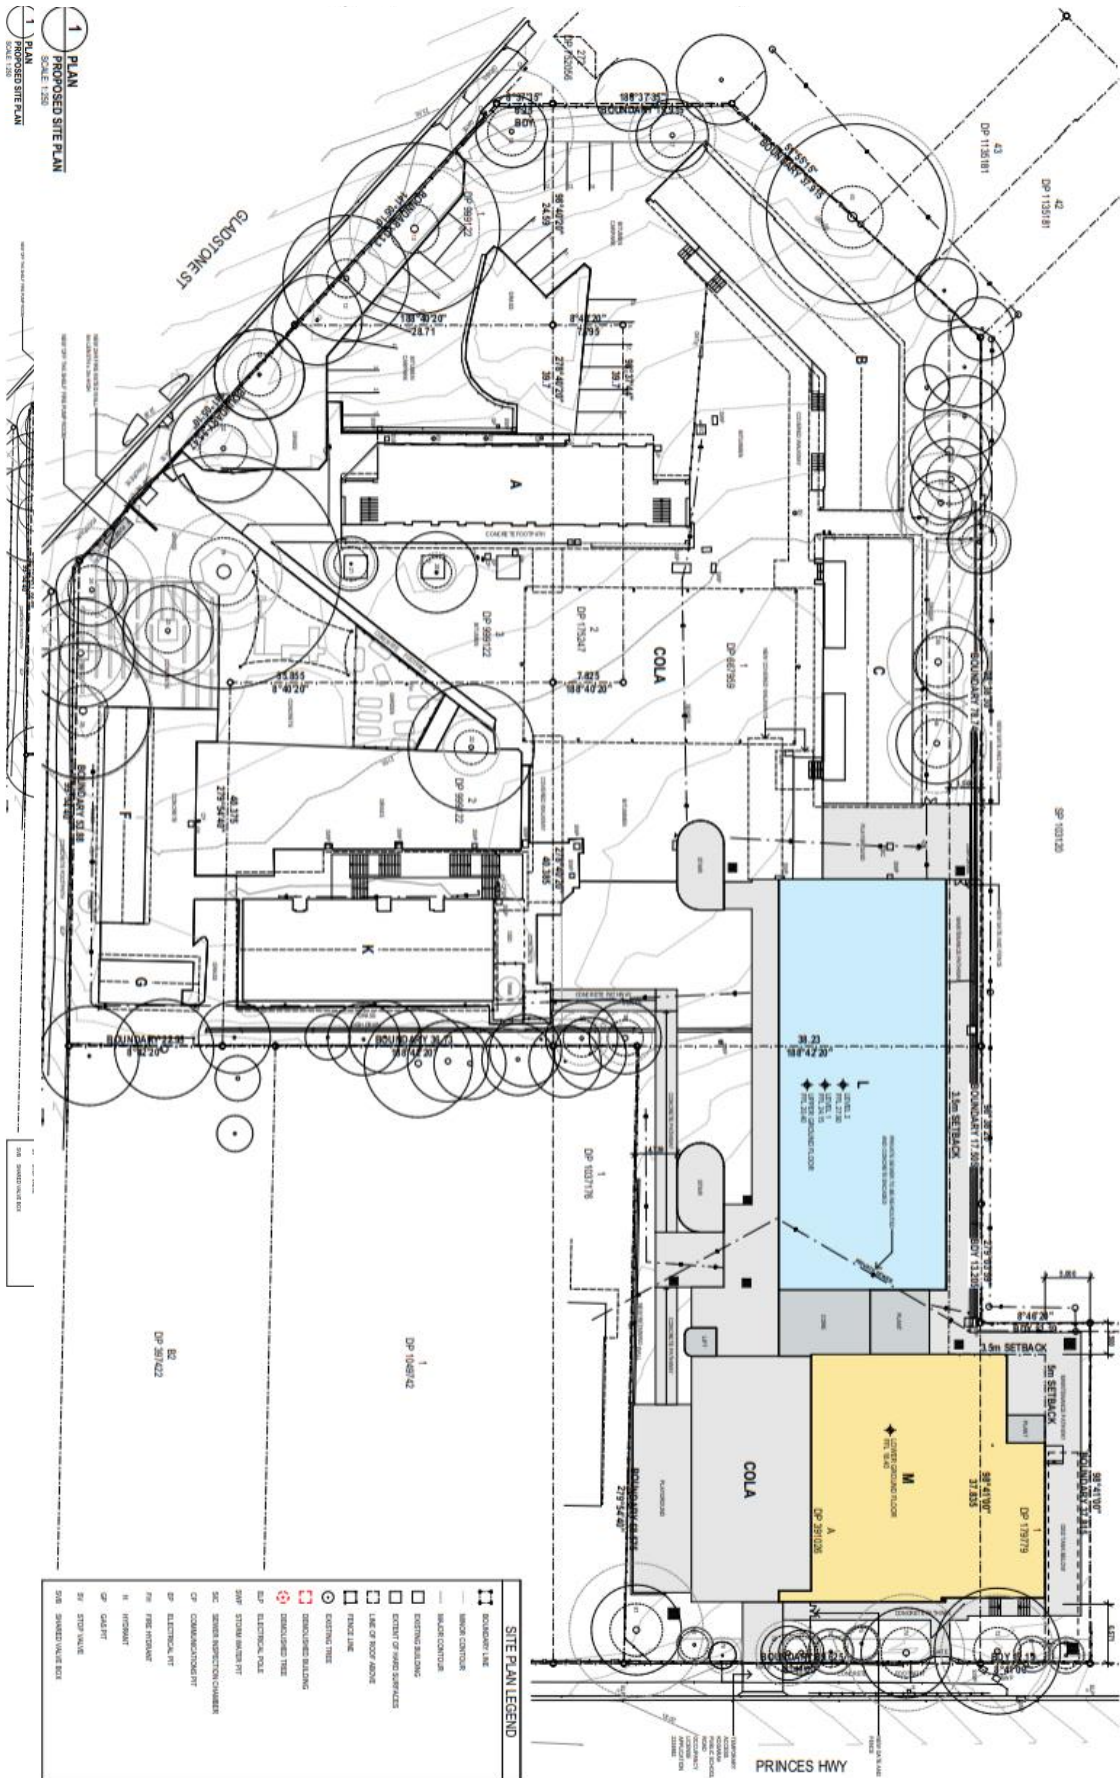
Extract of proposed Site Plan (Fulton Trotter, 2024)
